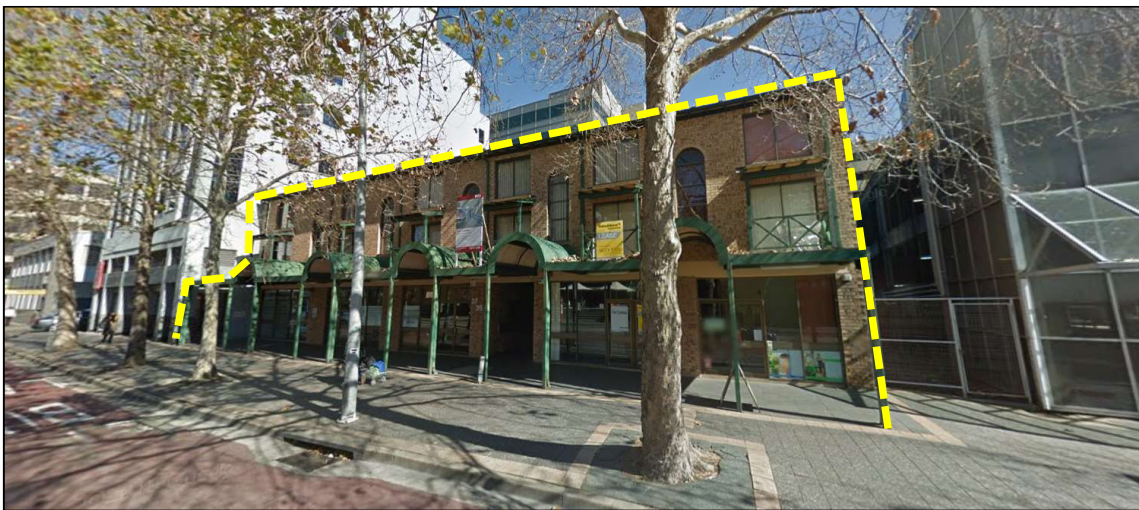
Site frontage to Smith Street- buildings since demolished via DA 395/2019
